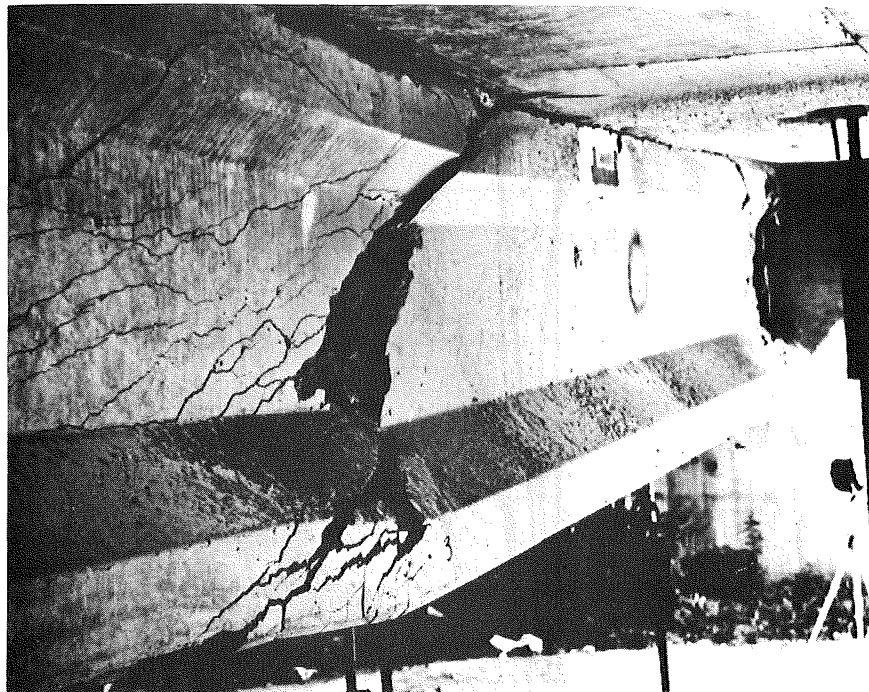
Photograph of One of the Prestressed Concrete I-Beams
